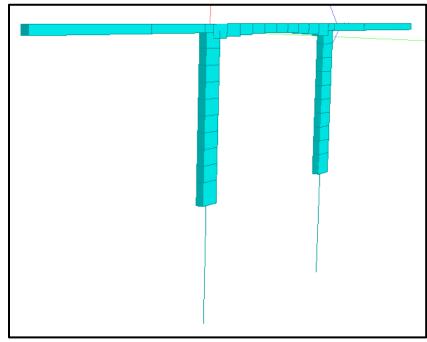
Modeled View of Strip with 6-ft. Abutment and Clay Soil
